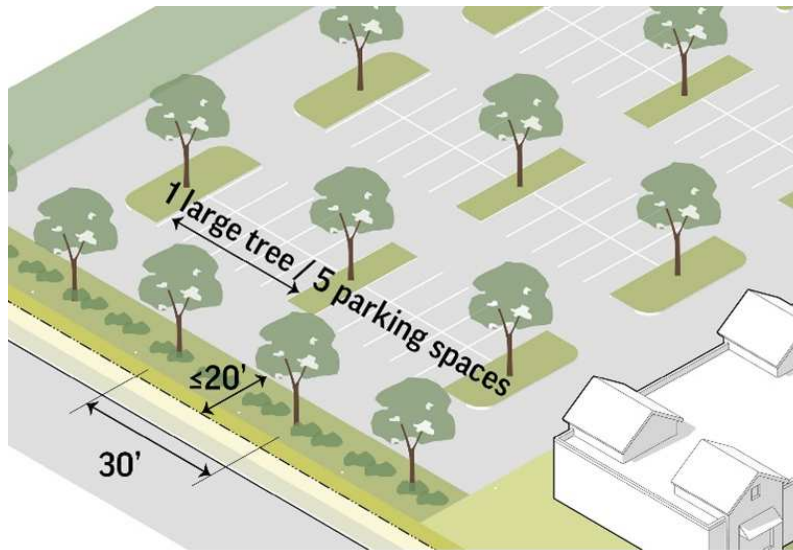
Parking lot landscape is dependent on the size, location, and relation to the streetscape as specified in section 16-7-4.
